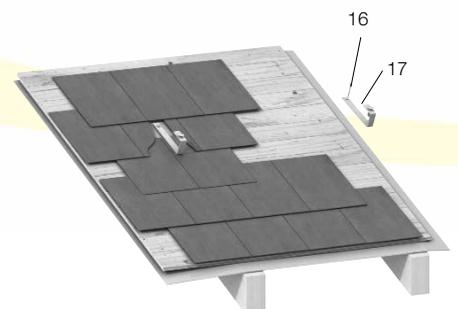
Fixing Mounting Battens and Roof Anchors through Sarking
